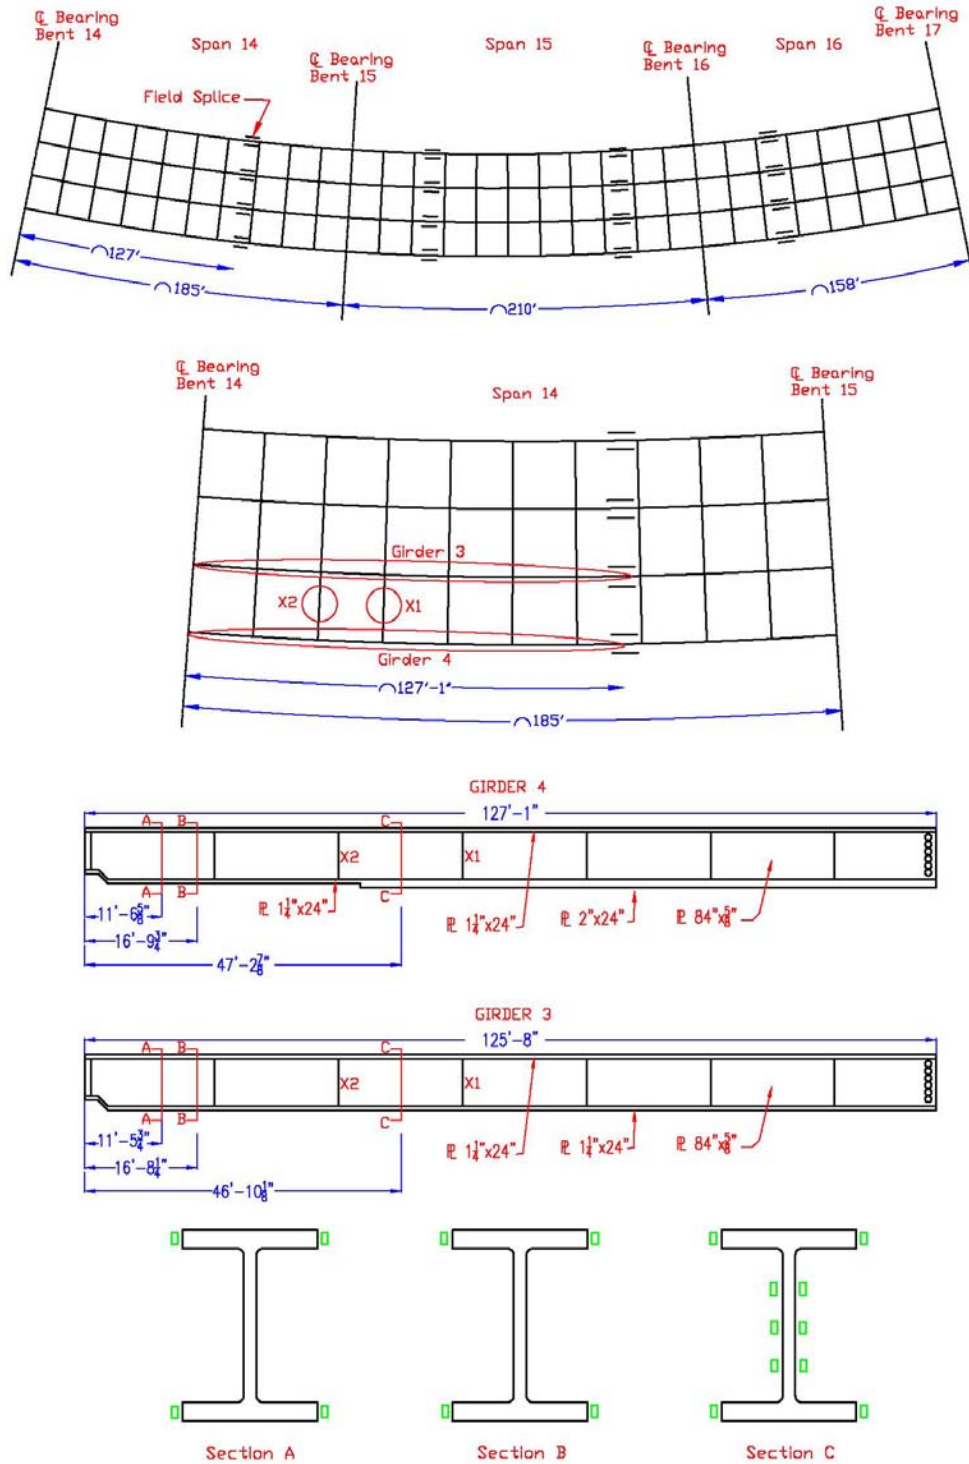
Unit 6 Bridge Layout & Girder Elevations w/ Gage Locations
